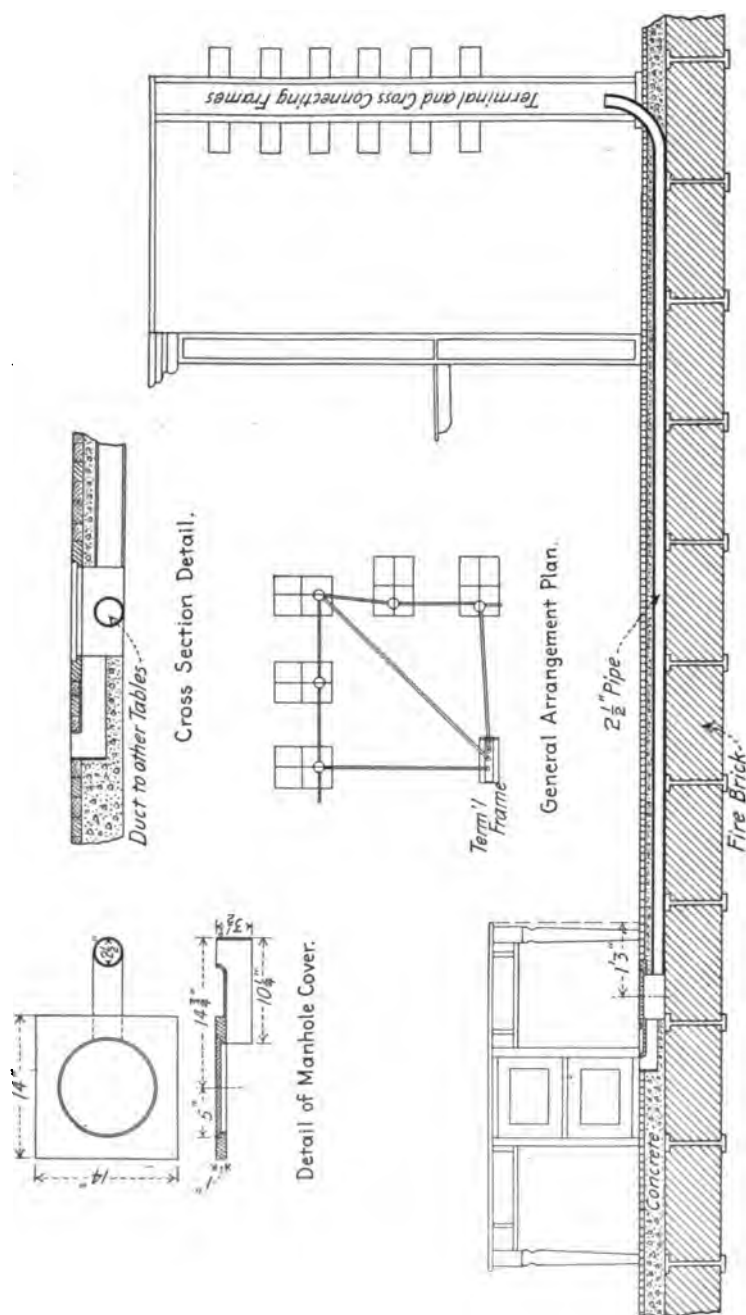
Floor duct cable distribution between cross-connecting frame and instrument tables.
